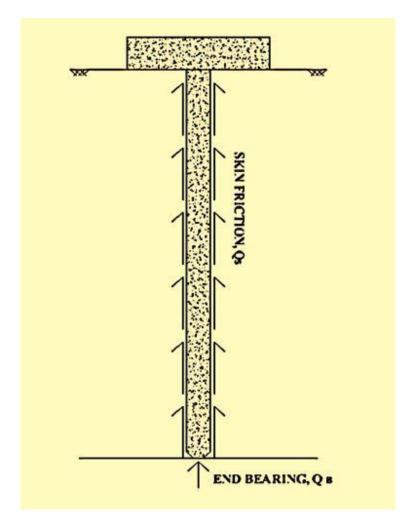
Longitudinal section of a typical pile (Das, 2002)
